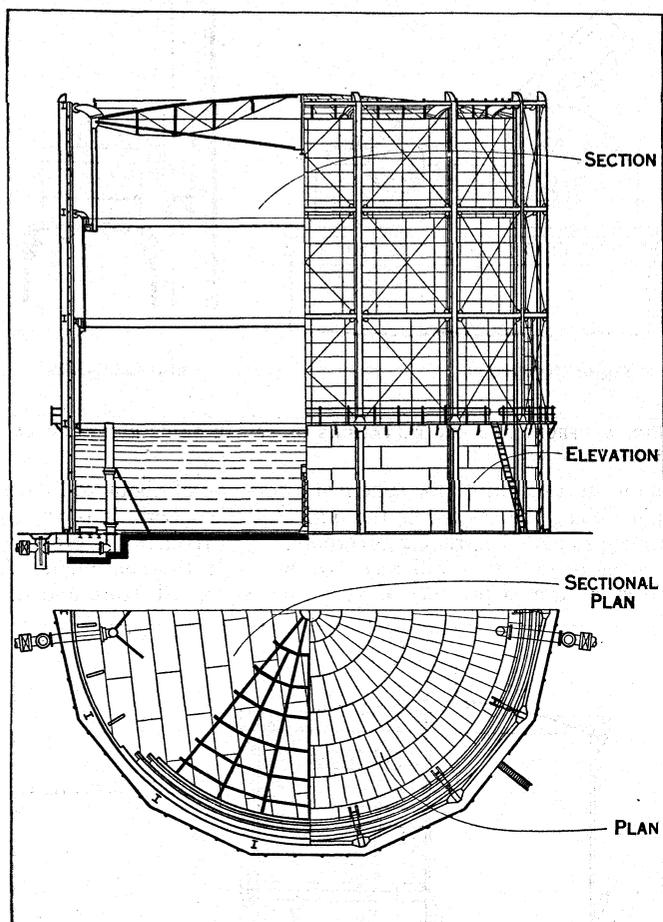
ELEVATION AND SECTIONAL PLAN OF TELESCOPIC GASHOLDERS
